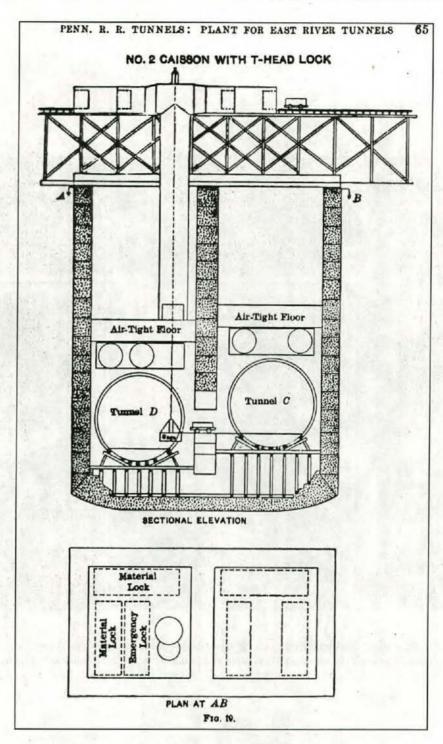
East River Tunnel - Two Caissons with T-Head Lock (New York Tunnel Extension: Description of the Work and Facilities, Vol. II, p. 65.)
